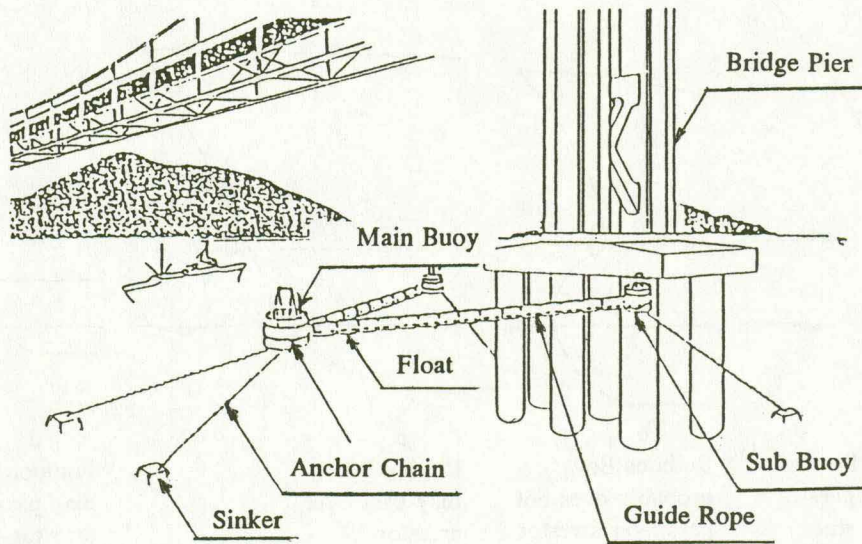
Cable System Protection Proposed for the Honshu-Shikoku Bridge Piers Across the Akashi Straits, Japan.
